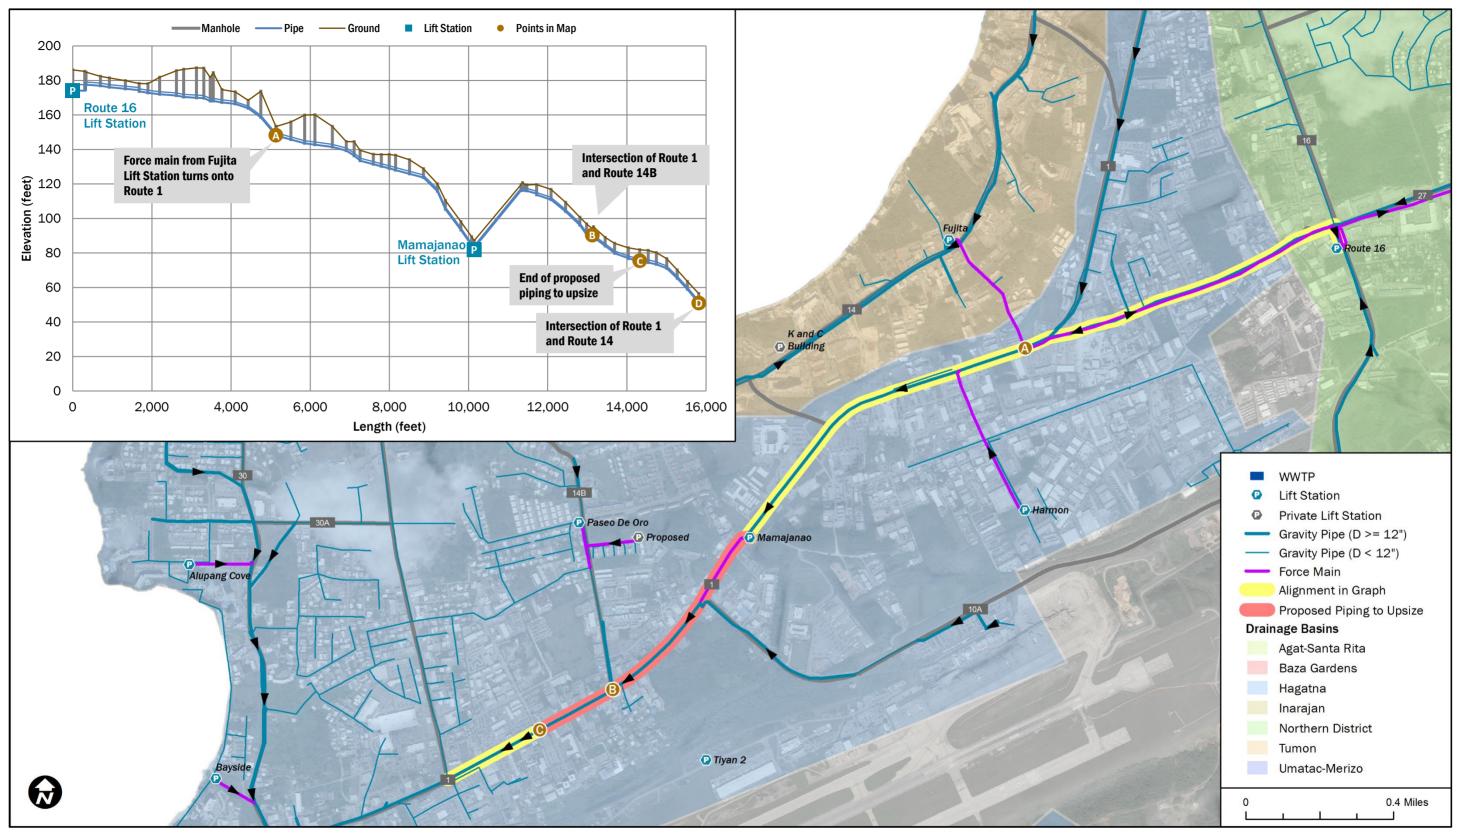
Profile of Piping to/from Mamajanao Lift Station
